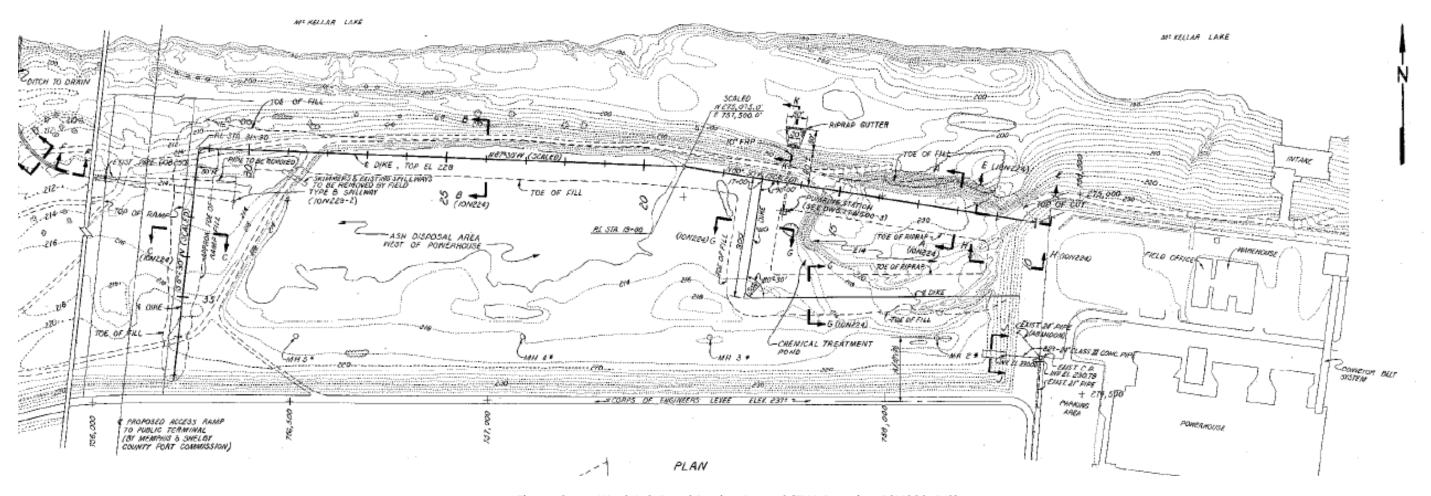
West Ash Pond Design Layout (TVA Drawing 10N223, R.2)
